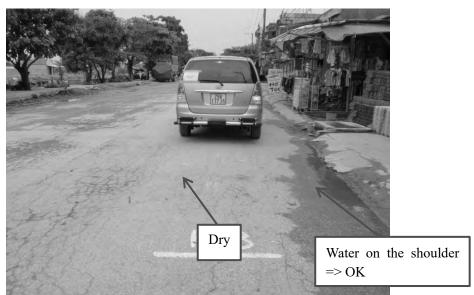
Road conditions where survey can be restarted (sample-1)
